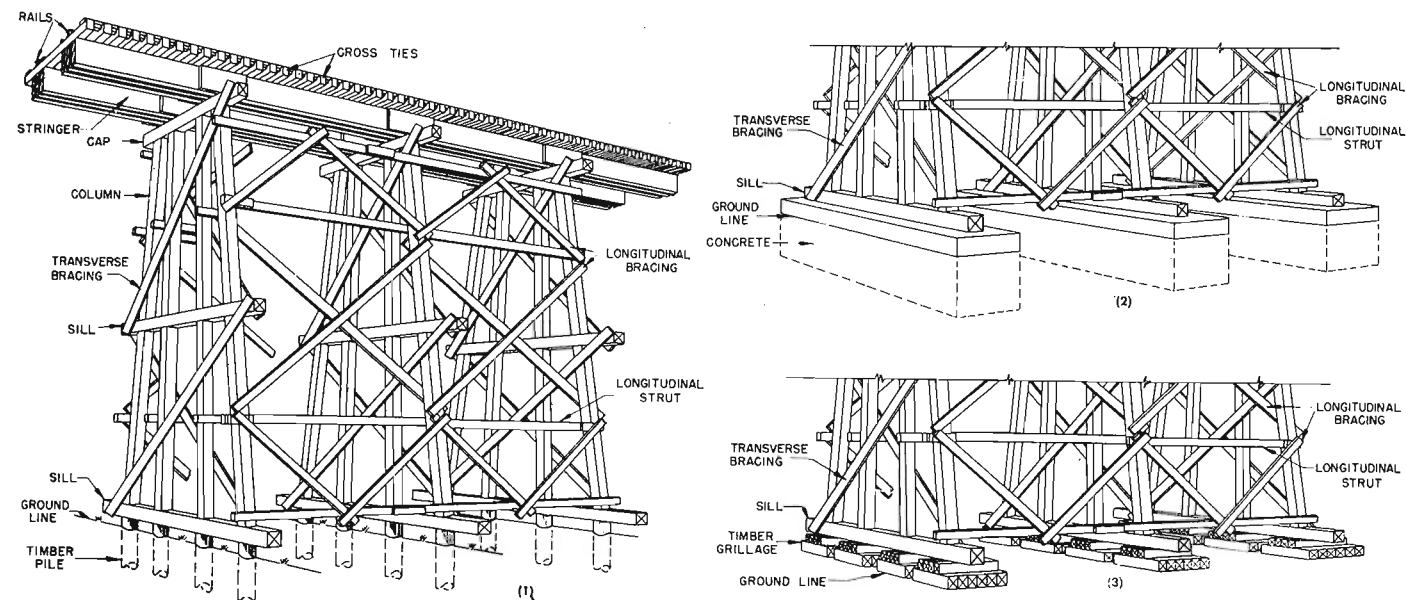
Railway bridge, timber stringer spans, framed timber tower:
